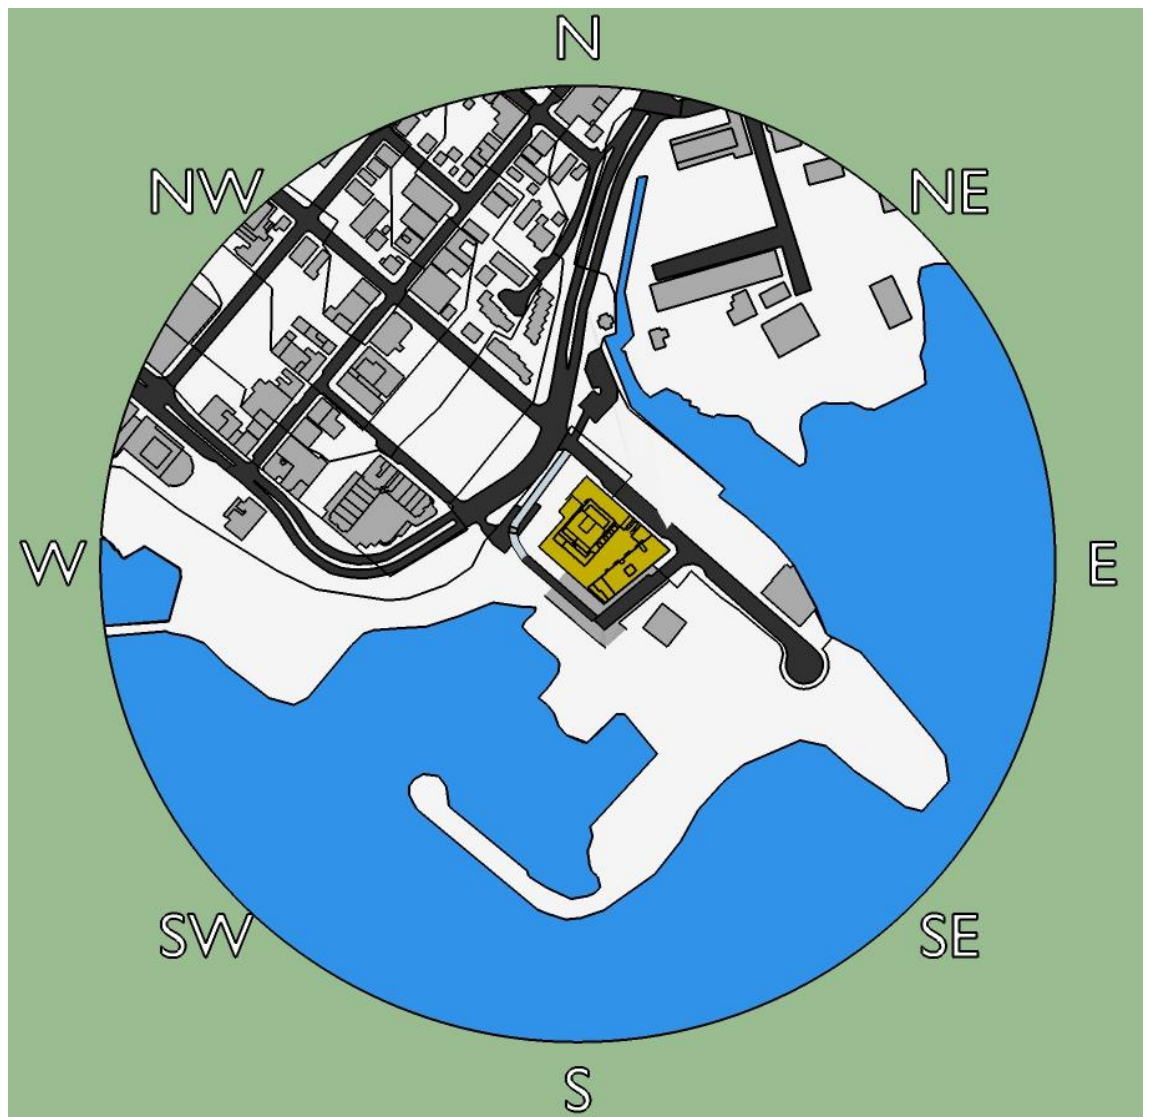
Proximity Model Plan for the Proposed Site Conditions
